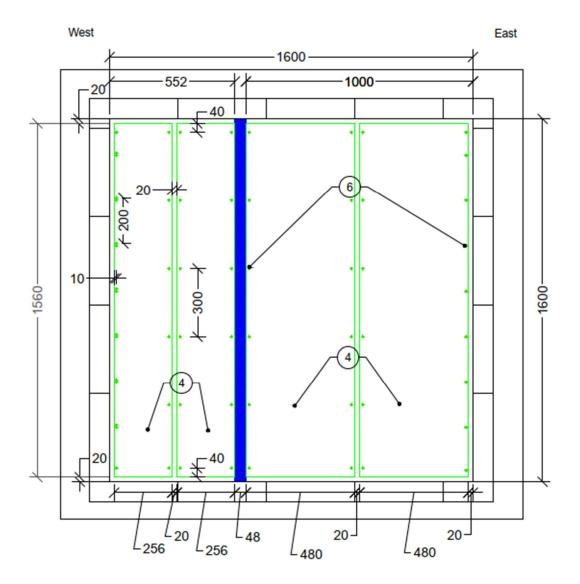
Elevation view of the first layer of plaster board (unexposed side)
